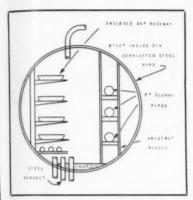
Electric cables in underground system are run in corrugated pipes along with water and slurry pipes.
